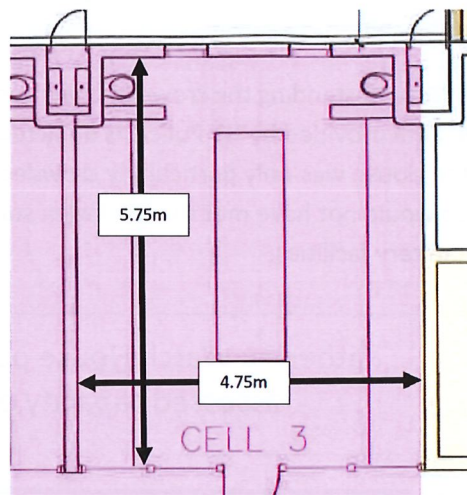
Diagram of cell 3. Floor plan provided by NT Police.
